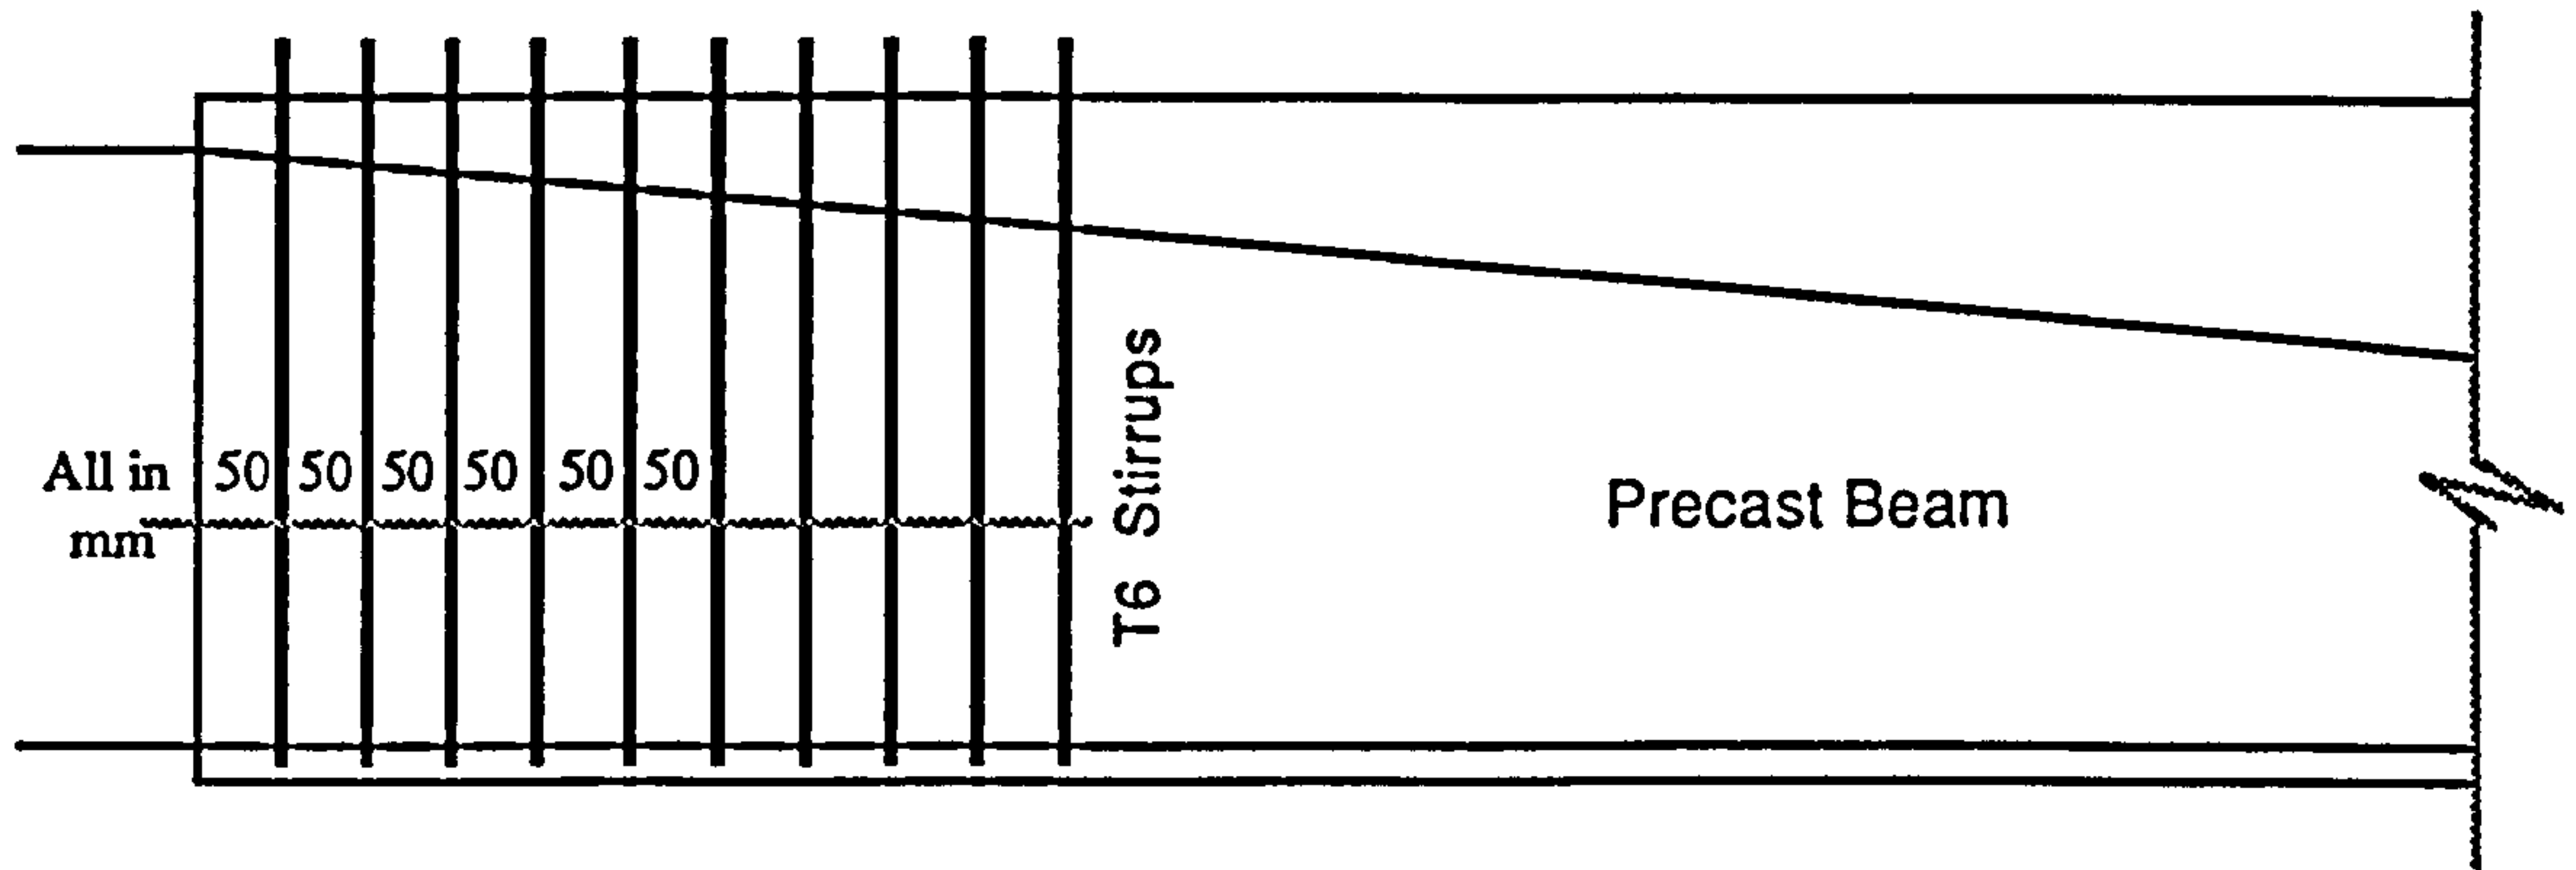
Stirrup Arrangement in the Embedment Part of Precast Beam E30AA1 ,E10CC5 and E10CD7 (but no Projected Bars into In-situ Concrete for Tests 5,7)
